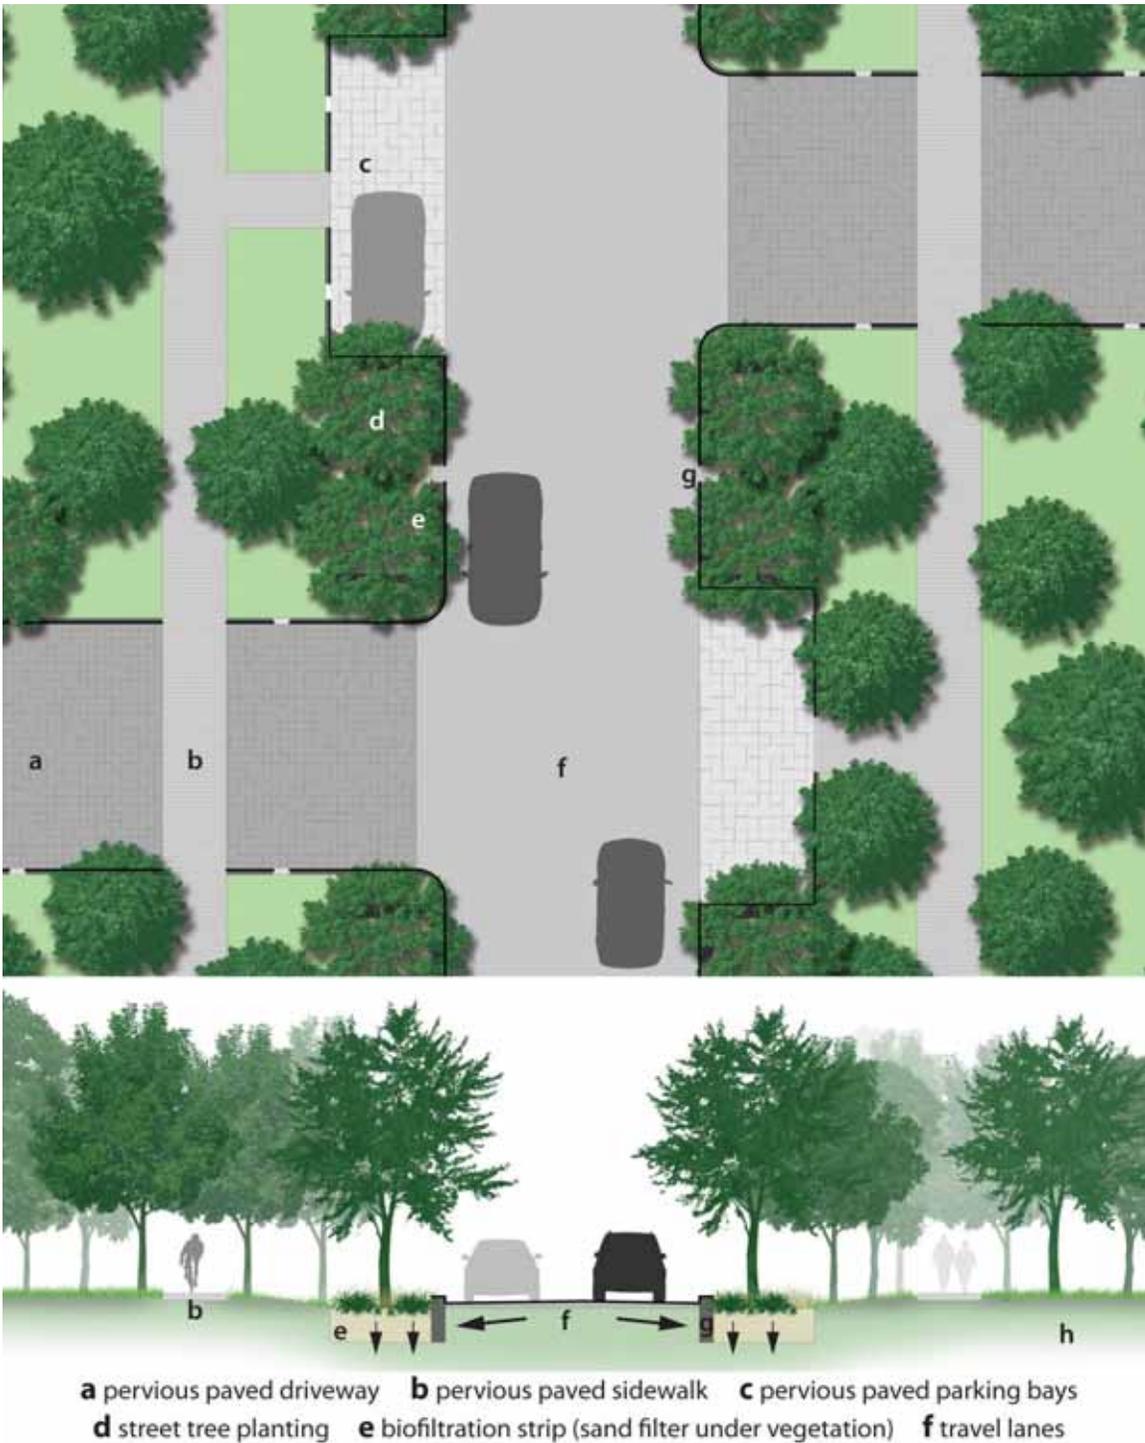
Above, plan of a typical biofiltration median Below, section of a typical biofiltration median
